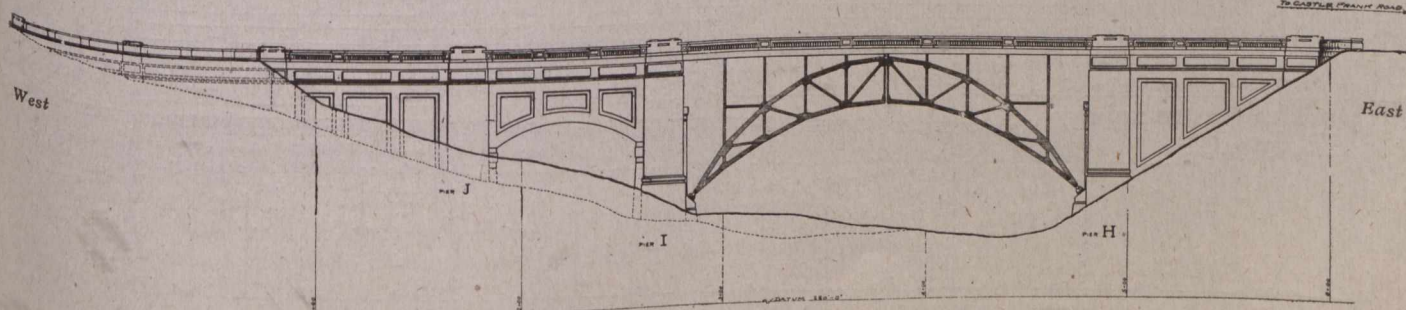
Elevation, Rosedale Section, Bloor Street Viaduct.
